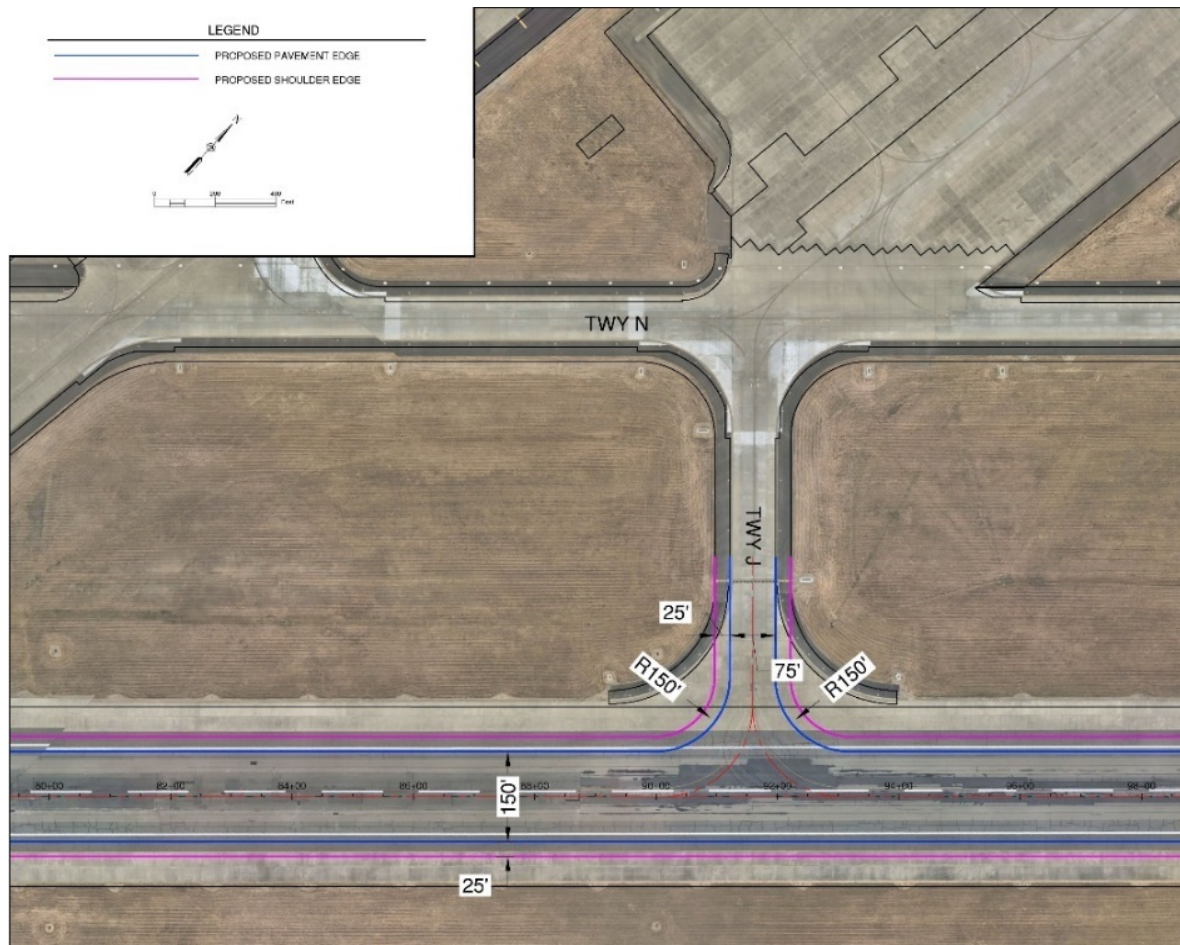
Proposed Realignment of Retained Taxiway J. Taxiways G & H to be realigned similarly. Figure showing reduction in width and minor adjustments to geometry.
